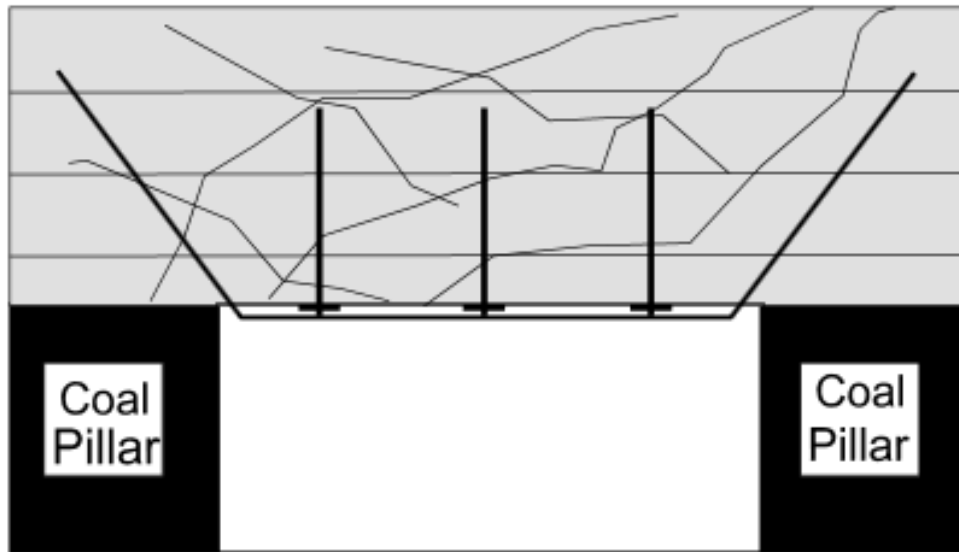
Supplemental support in failing roof. In some situations where the roof is extremely weak or the stress is extremely high, roof bolts are not able to prevent the failure of the roof from progressing beyond a reasonable anchorage horizon. Cable bolts, cable trusses or standing support are then necessary support. (Mark, Molinda and Dolinar, n.d.).
